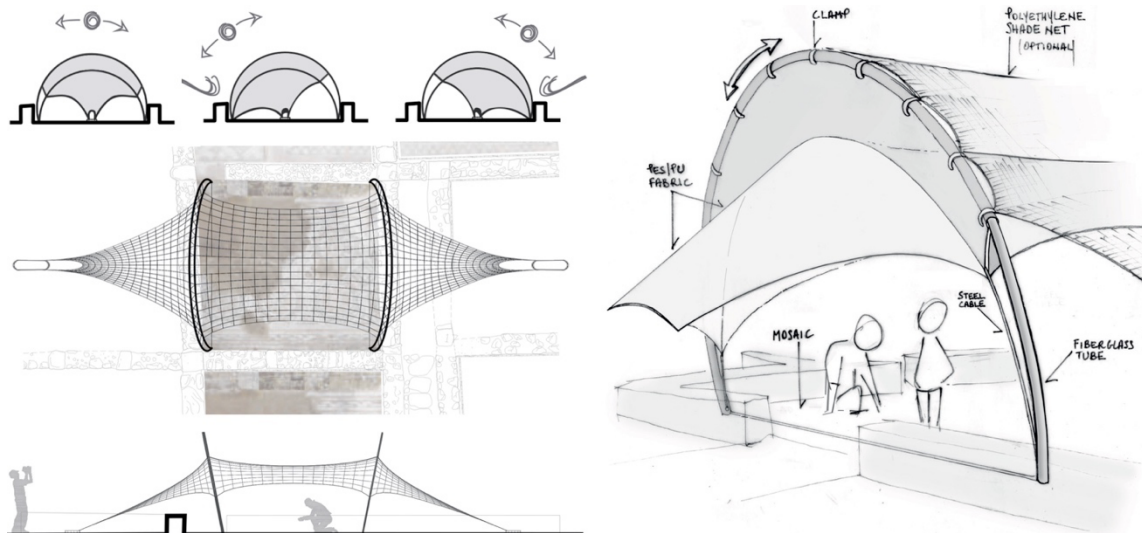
Scheme of textile layer orientations and architectural drawings (plan and elevation) of the covering system (left). Sketch of connections with arches (right).
